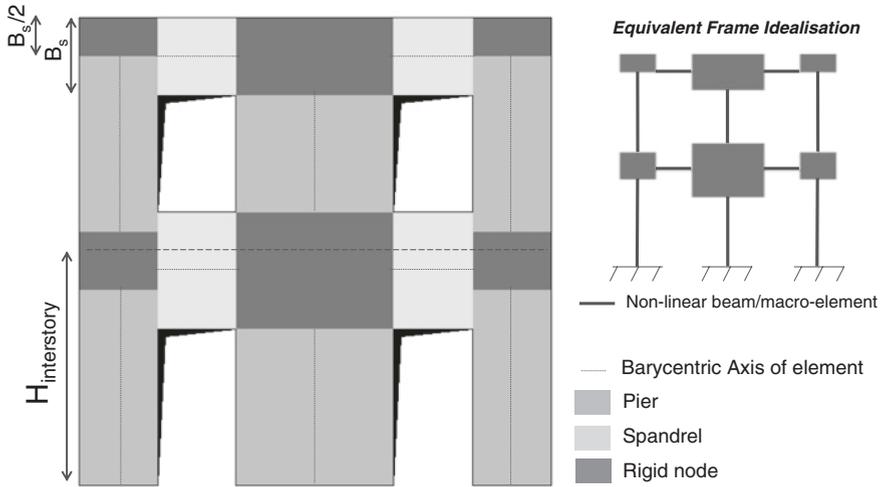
Equivalent frame idealisation of a masonry wall [38]
